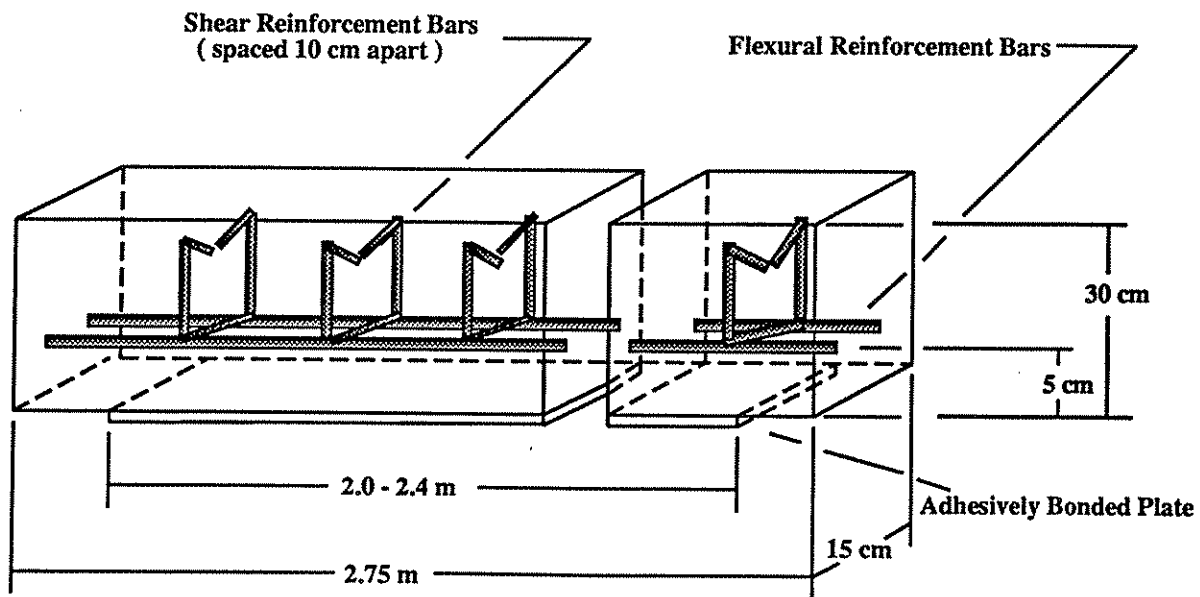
Construction of reinforced concrete beam with adhesively bonded plate.
